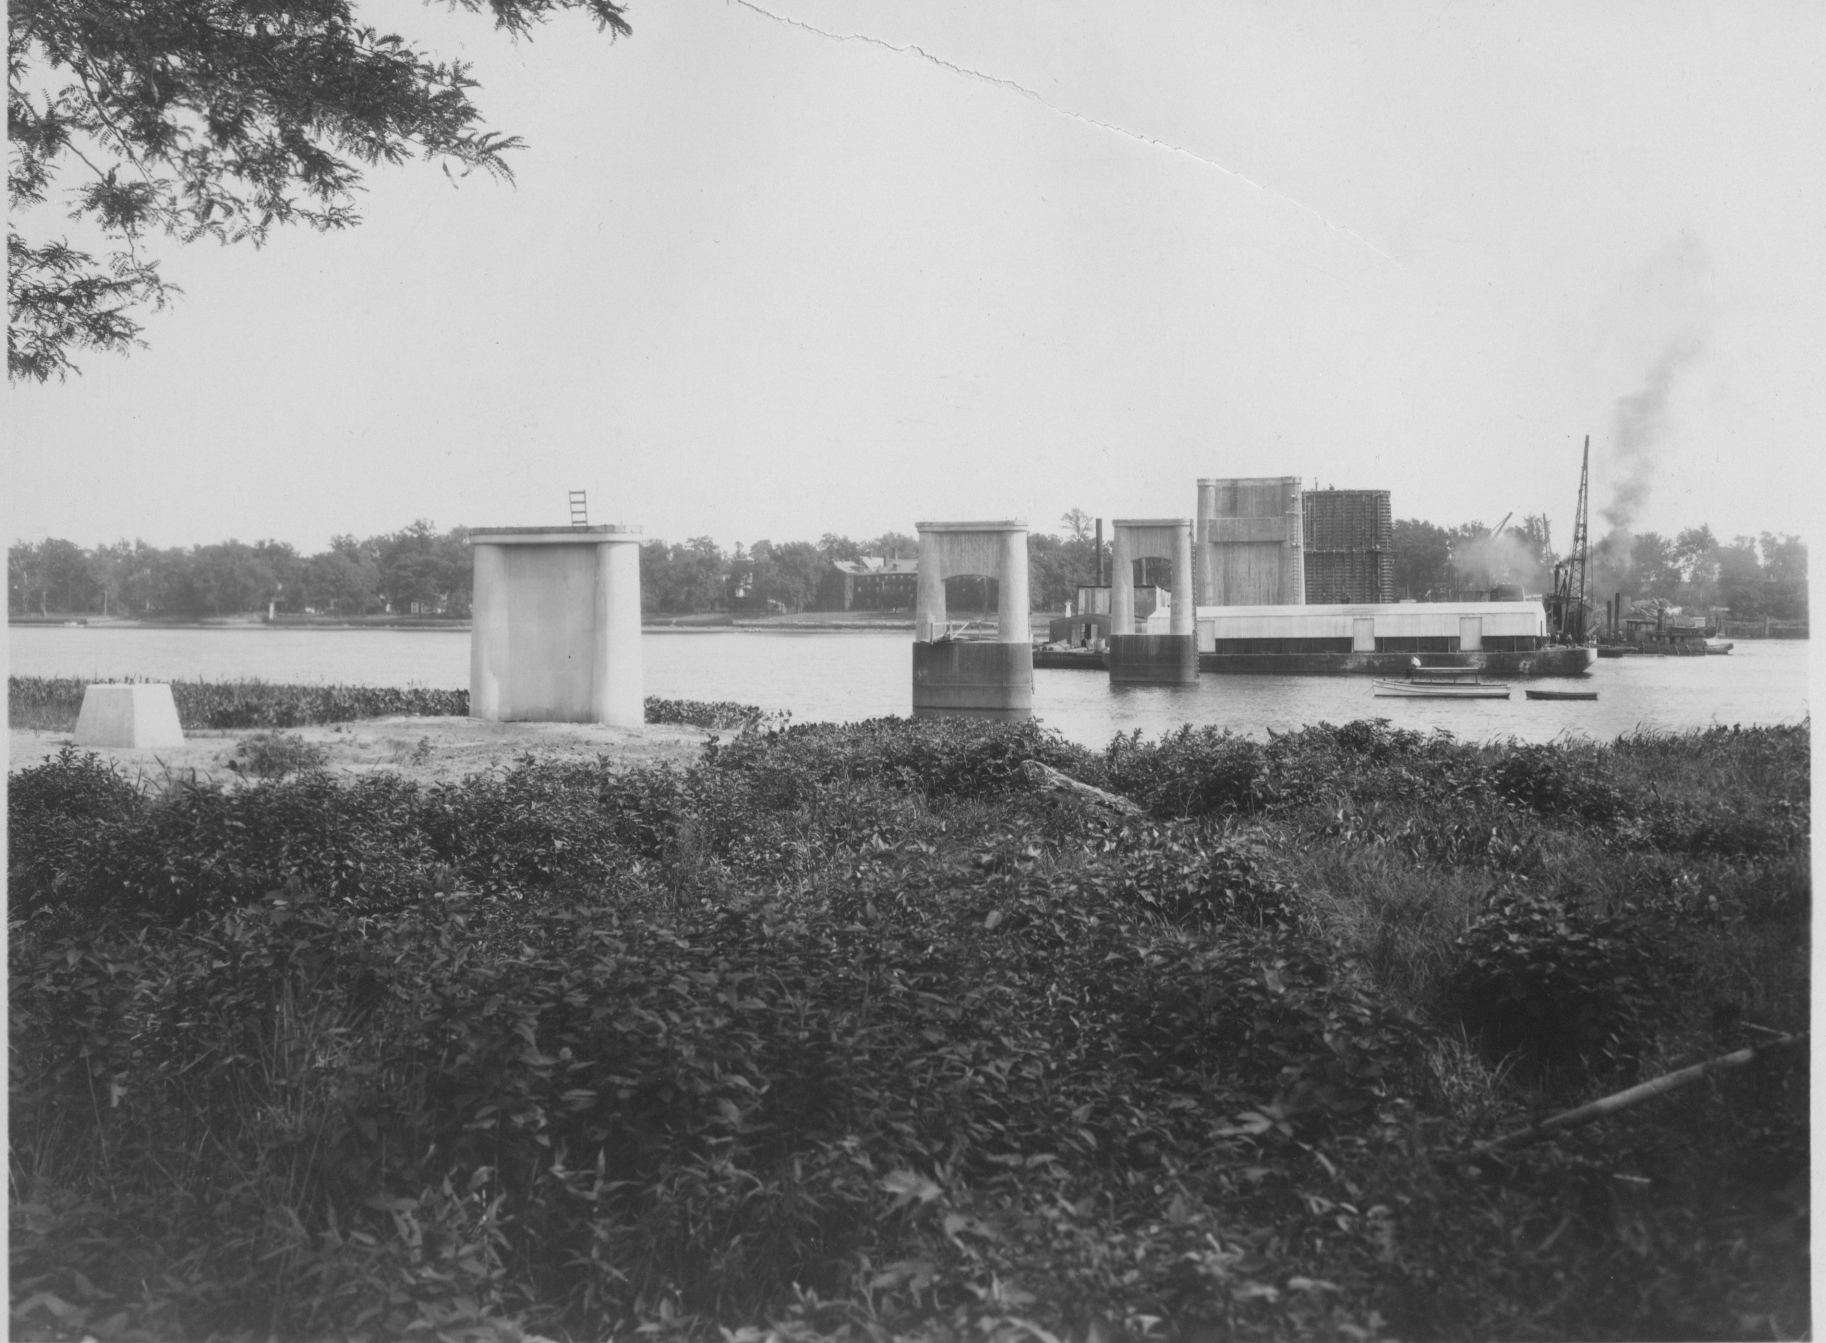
Layout of piers from Pennsylvania shore. Pier #5 with forms.
